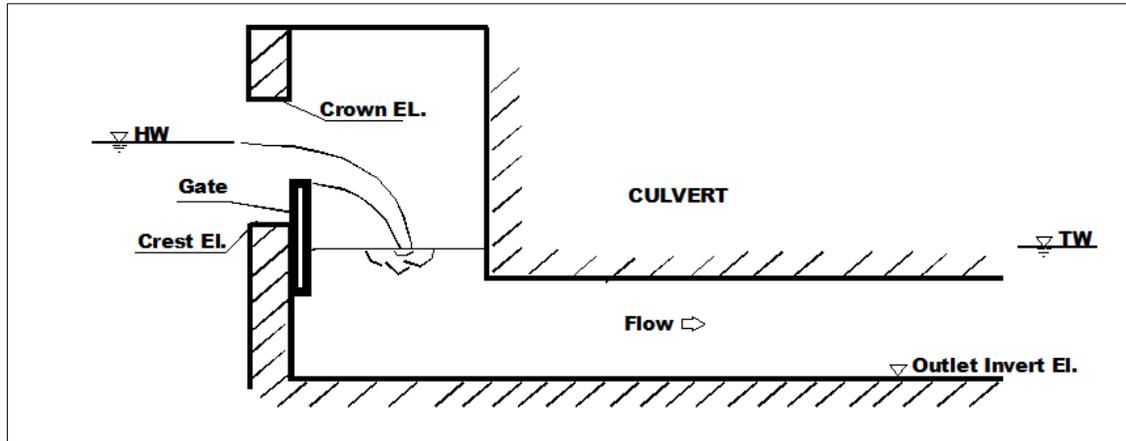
Illustration of a weir-box culvert with a slide gate installed in the inlet tower
